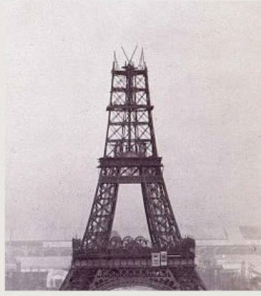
A scaffold being scaffolded. When the timber came down, nothing changed.
